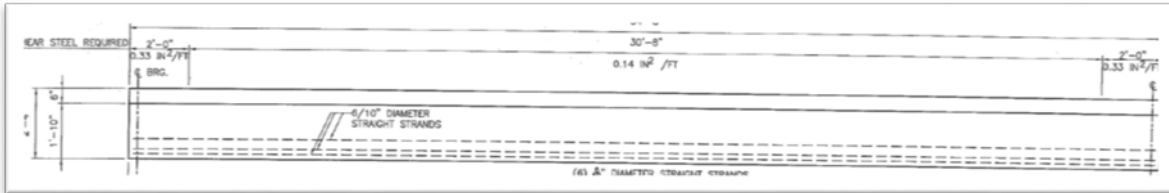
Elevation view of exterior beam of Bridge 8761 from rehabilitation plans.
